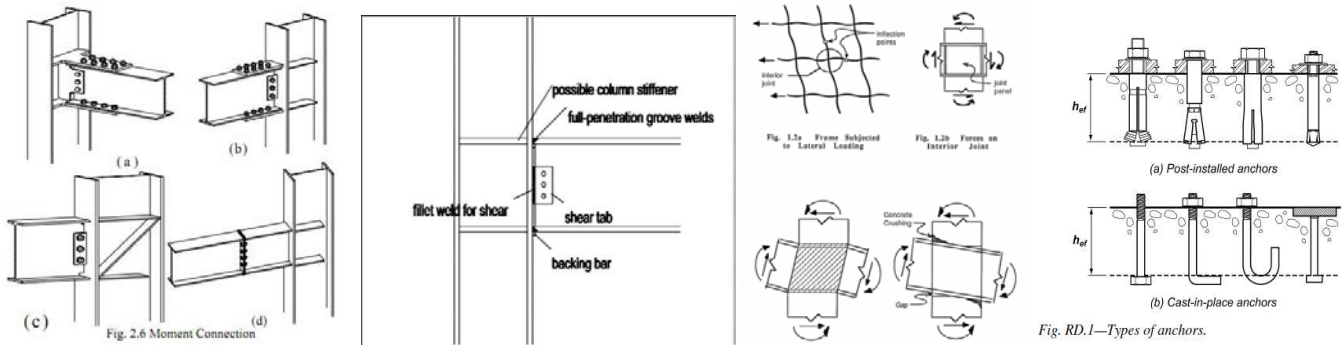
Different Moment Transfer Connection Details & Composite Column connection zone nature & Anchorage elements
